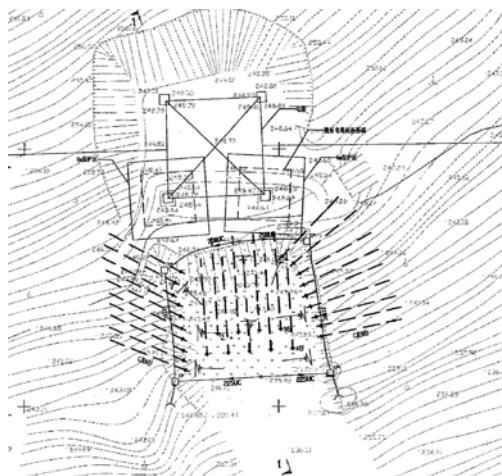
Proposed Alternative Upgrading Scheme - Integrated Slope Upgrading Work
